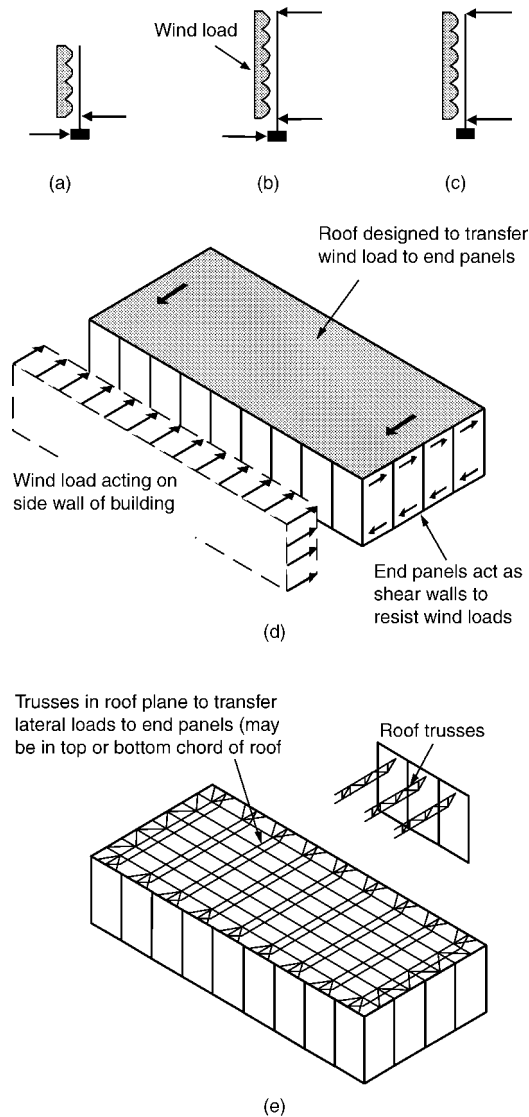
Transverse-load resistance (courtesy Reinforced Concrete Council): (a) straight cantilever; (b) propped cantilever; (c) simply supported; (d) principle; (e) general arrangement (stability in case (a) is by straight-cantilever action; for cases (b) and (c) see (d) and (e))
